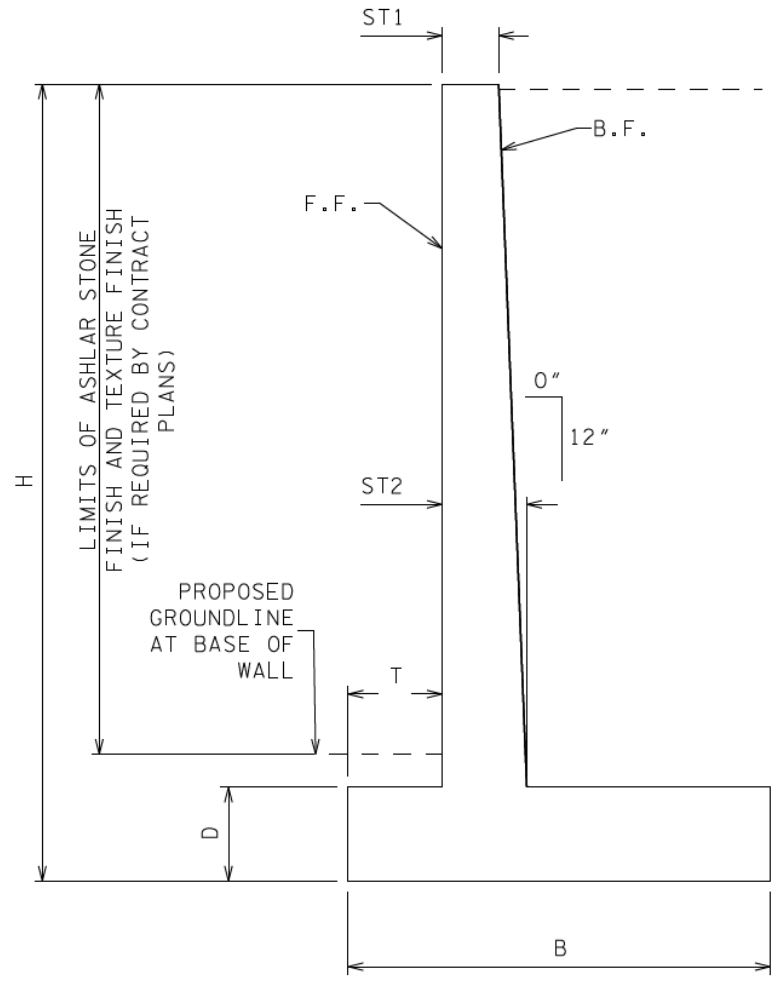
Typical Cross Section of I-24 Exit Ramp CIP Walls.
